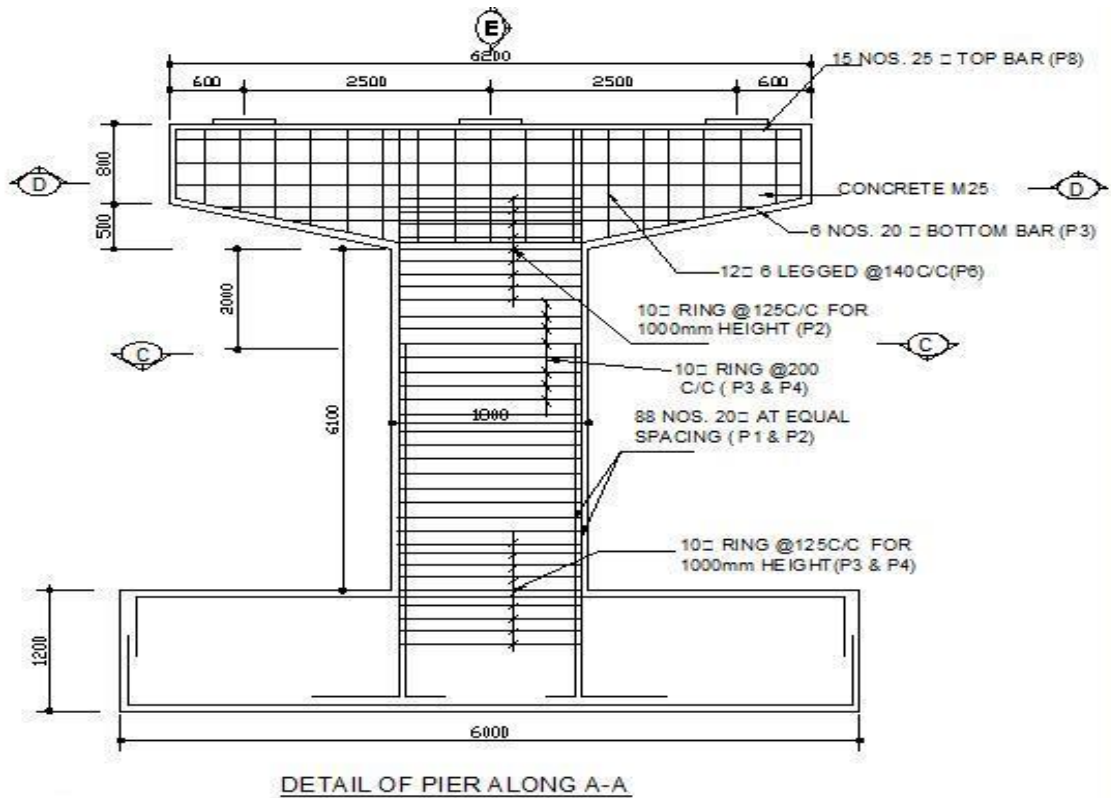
Reinforcement details in Bridge pier After 2000 Pile
